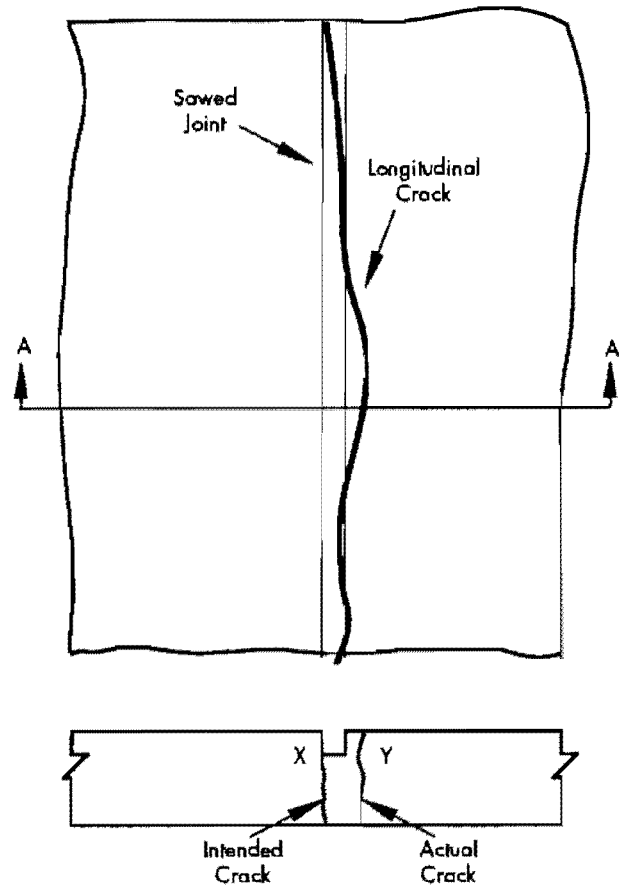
Concrete pavement with saw-cut joint and random longitudinal crack (Ref 1)
